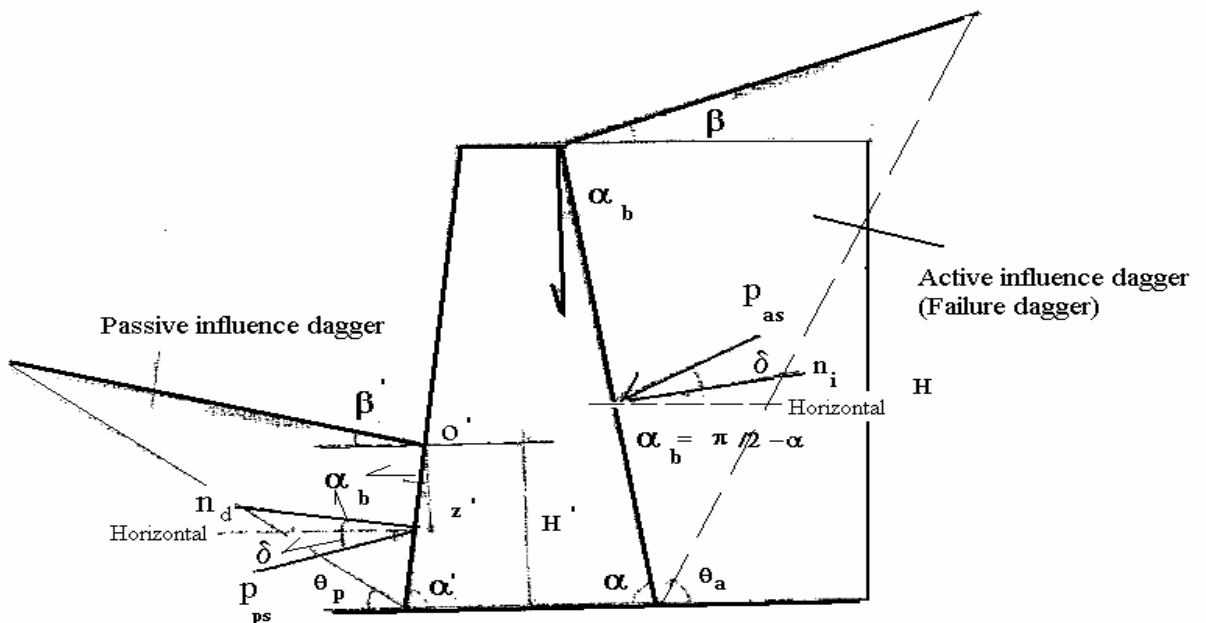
Lateral stresses occurred in gravity retaining wall on static active and passive position (Das, 1987).
